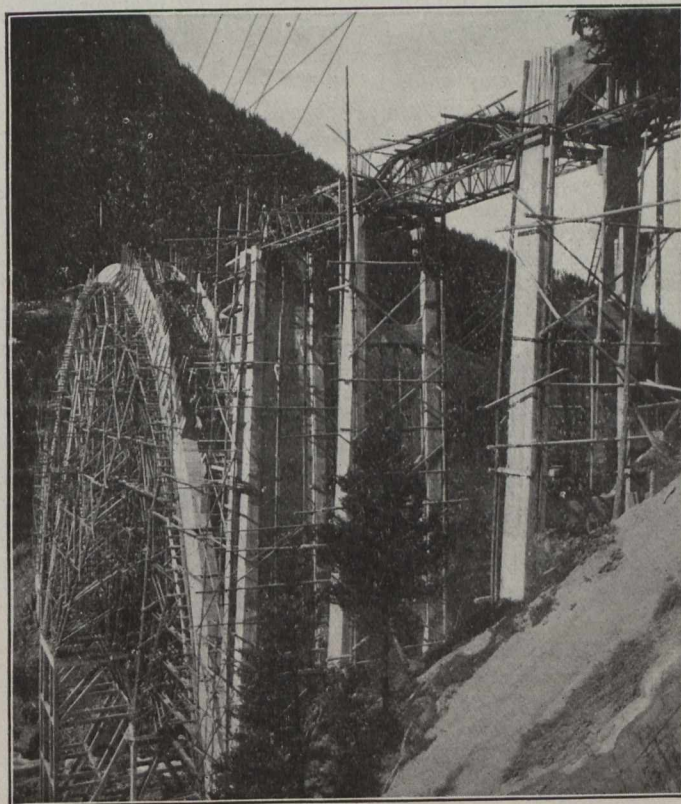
End View of Falsework, Showing Transverse Bracing—Approach Span Piers in Foreground.
